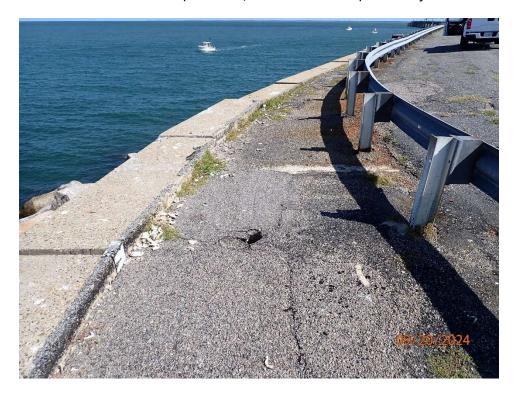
Portal Island 4 Splash Wall; newly forming sinkhole behind guardrail on west side of island. Depth of sinkhole could not be verified.
